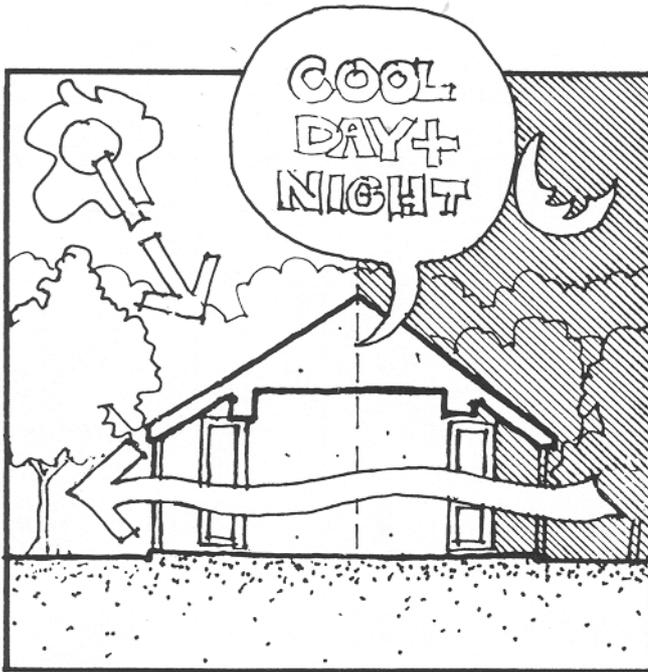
Ventilation principles *Source: North Coast Design Guidelines
